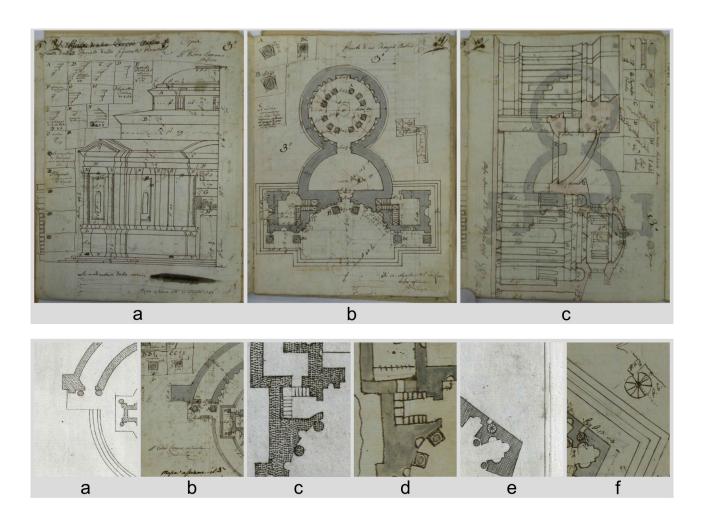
Tempio antico. a) half elevation with details; b) plan with details; c) section with details. Cipriani 1786-1791, cc. 5v, 6r, 6v.
